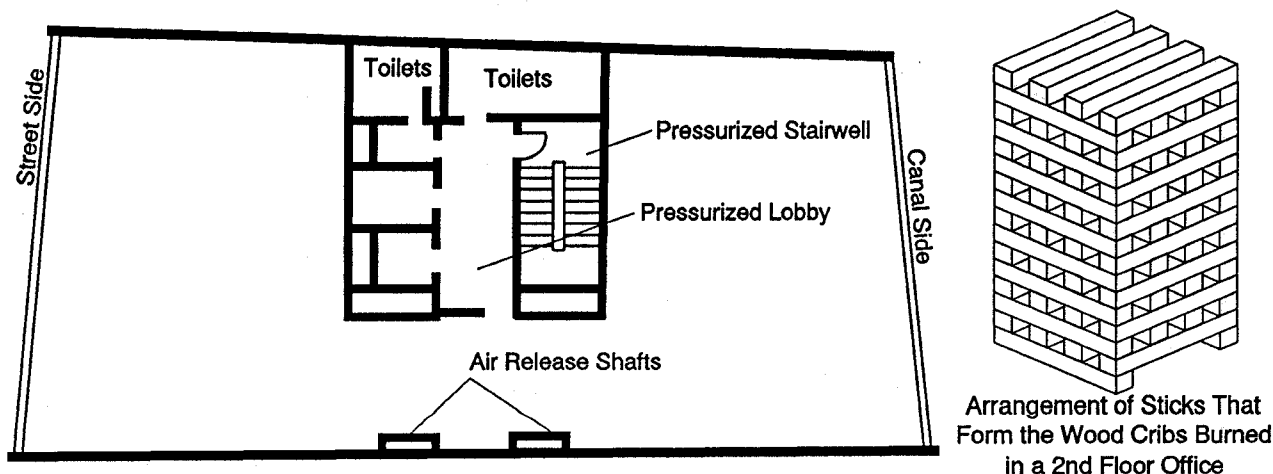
Typical floor plan of Hamburg office building and arrangement of wood cribs burned.
